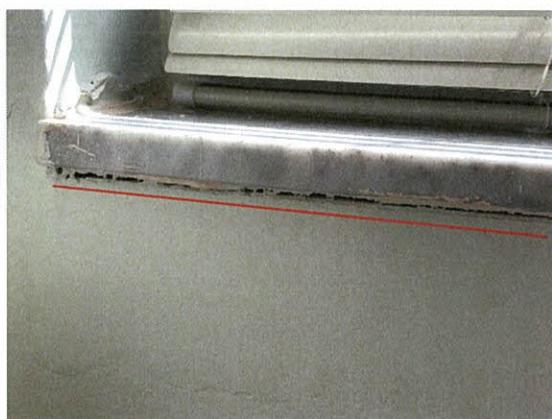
Water damage observed at window jamb location which enter the unit through opening created by the buffeting of windows due to Irma's wind pressures.
